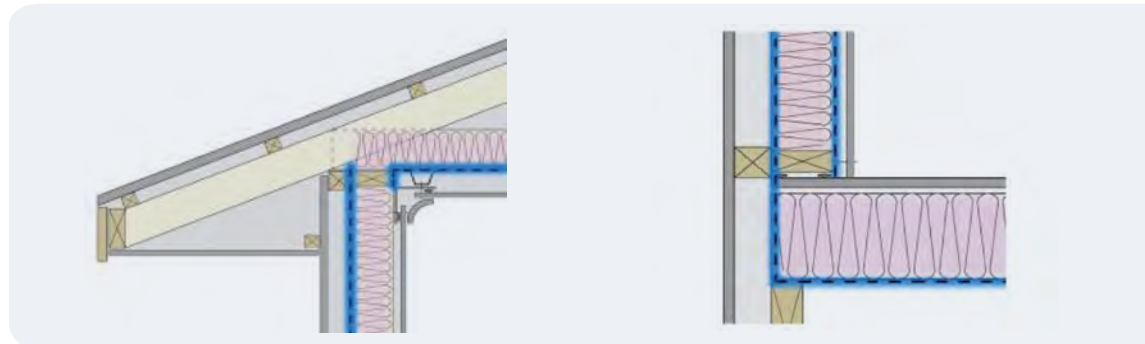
Seal ceilings to walls. Continuous seal created by fixing to wall plate.
